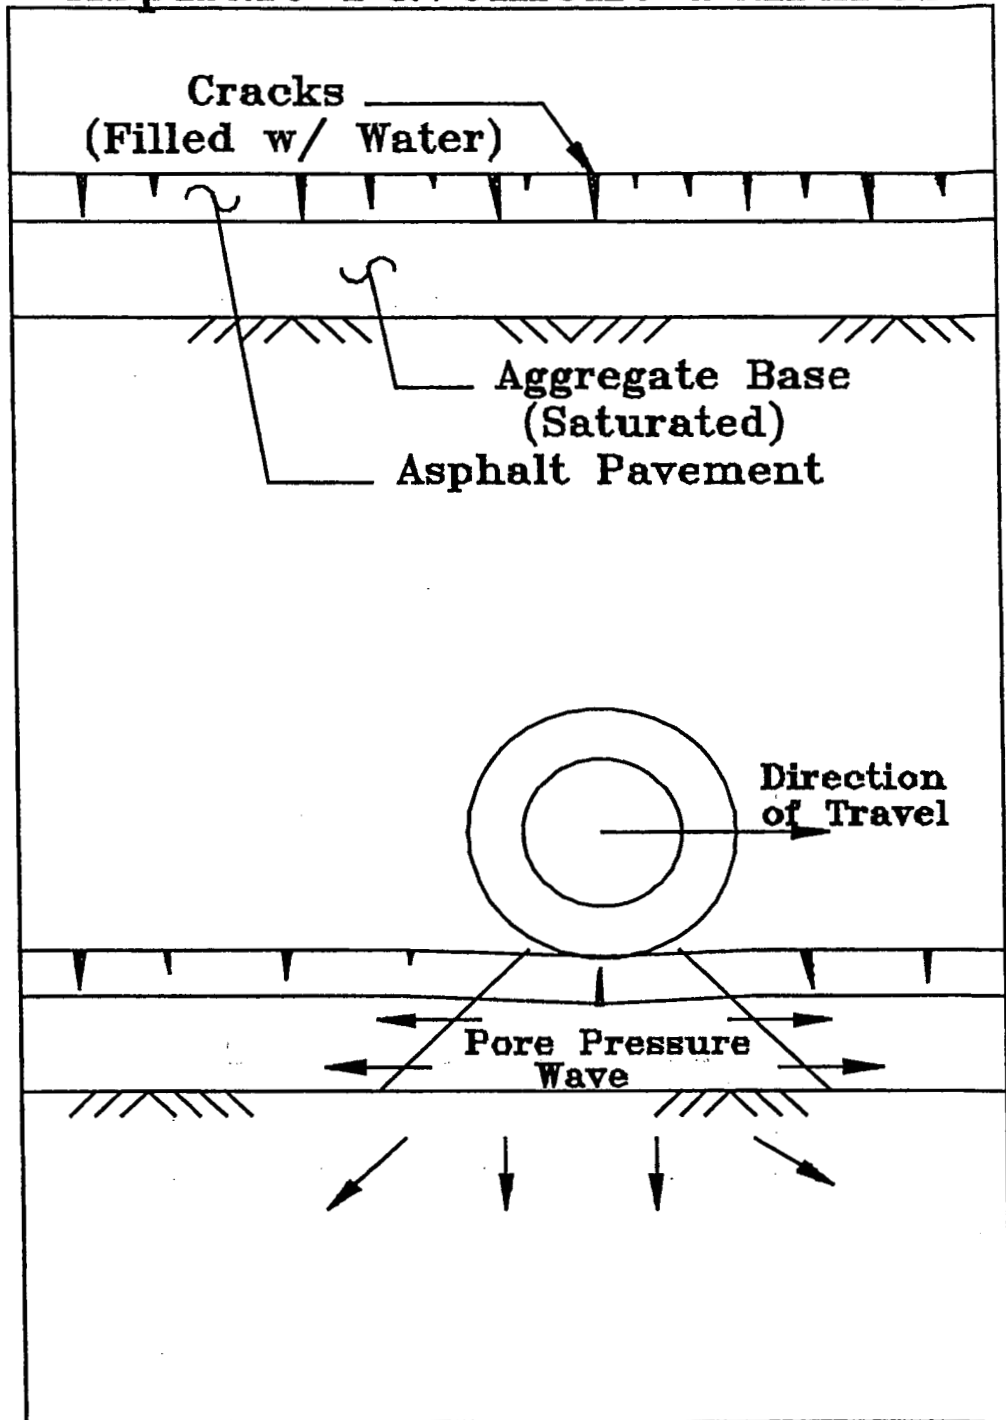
Asphalt pavement failure (from Moulton, 1980)
